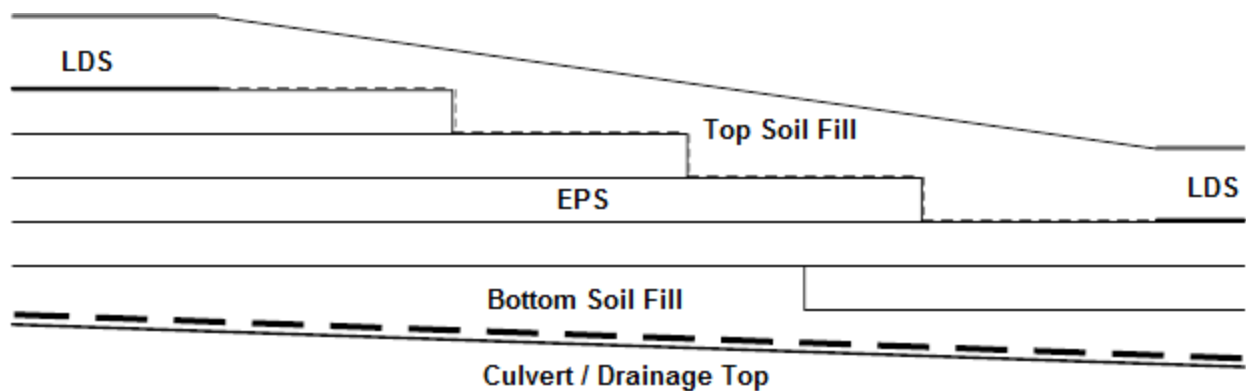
Adjusted Design Longitudinal Profile (Negussey et al., 2014)
